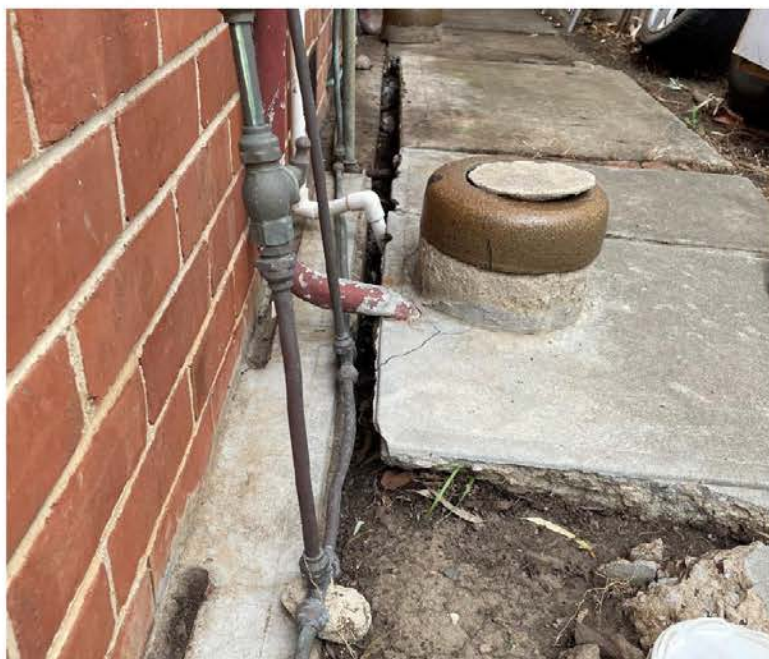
Severely damaged perimeter pavement - 9 Clifford
